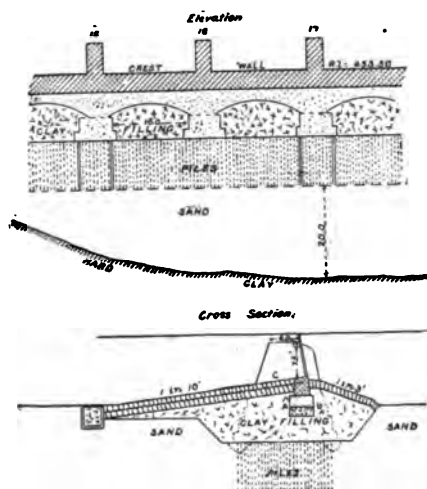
Elevation and Cross-section of Sidhnai Weir, India.
